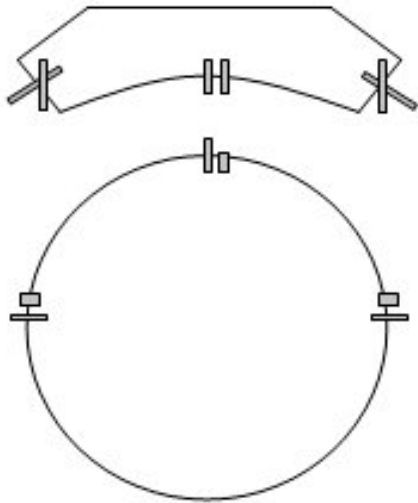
Plan and elevation view of outer plug with joint meter locations (not to scale)
